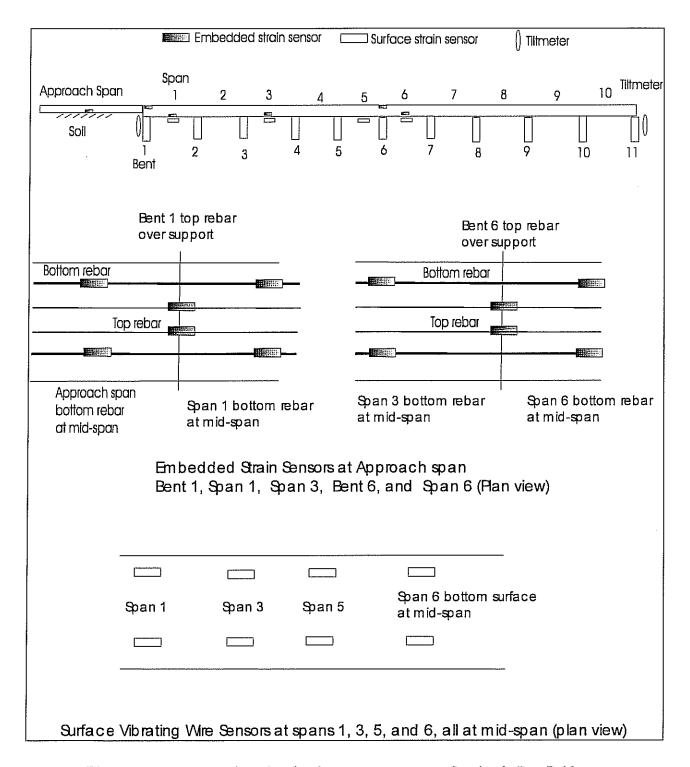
Instrumentation plan for the superstructure at Caminada Bay Bridge
